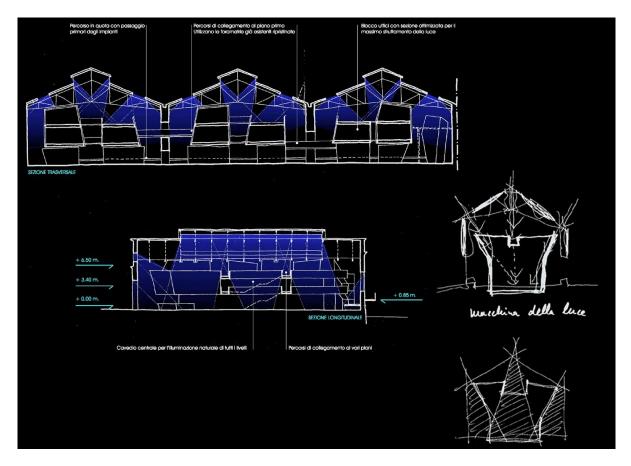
Plans for the interior of the Novissima Grande construction halls (architect: A. Cecchetto)
